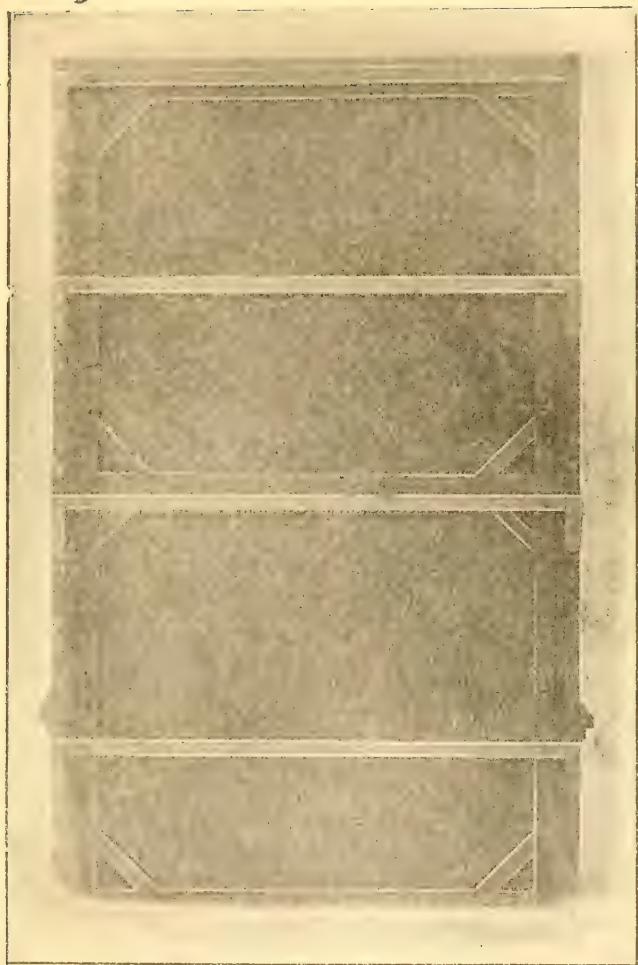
IMPROVED METHOD OF FASTENING THE DOOR
